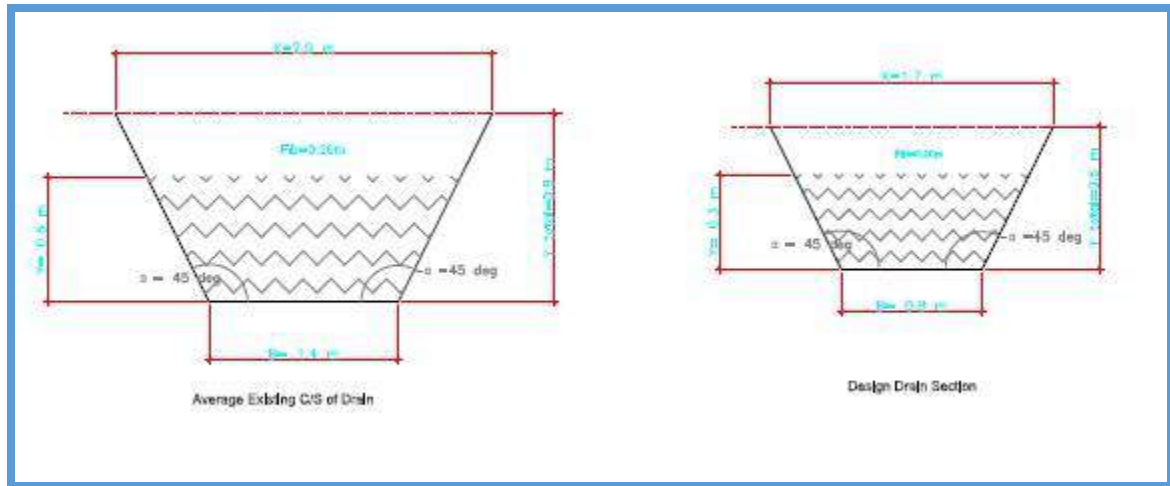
Typical Drain Cross Section for Covent Garden Roadside Earthen Drains
